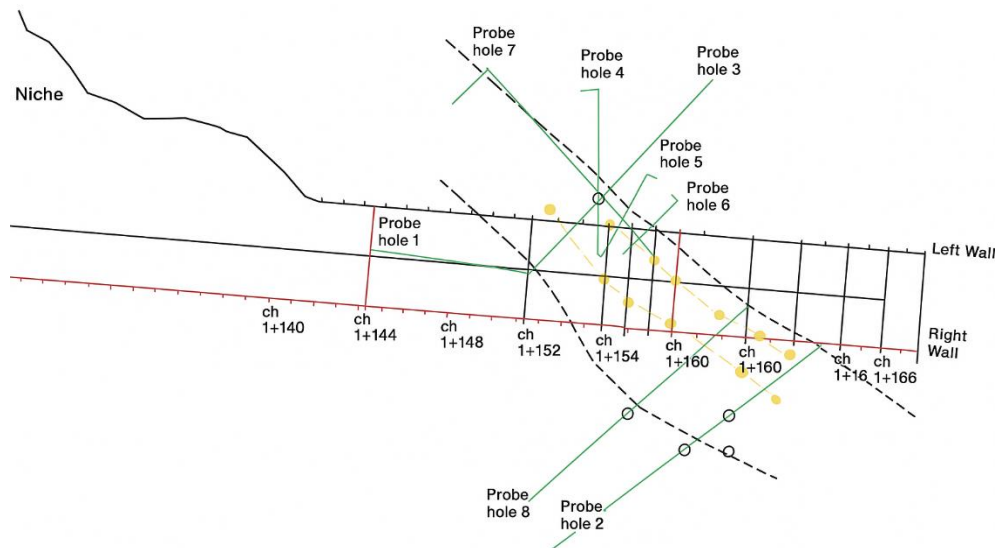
Delineation of the location & orientation of probe drilling shown on plan of HRT
